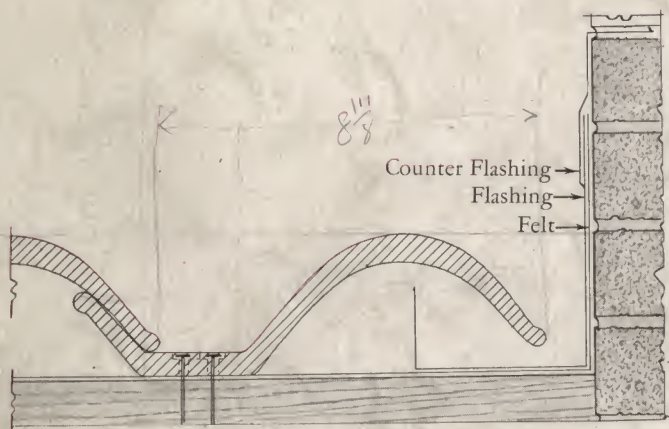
DETAILS OF "IMPERIAL" SPANISH TILE AND FITTINGS
